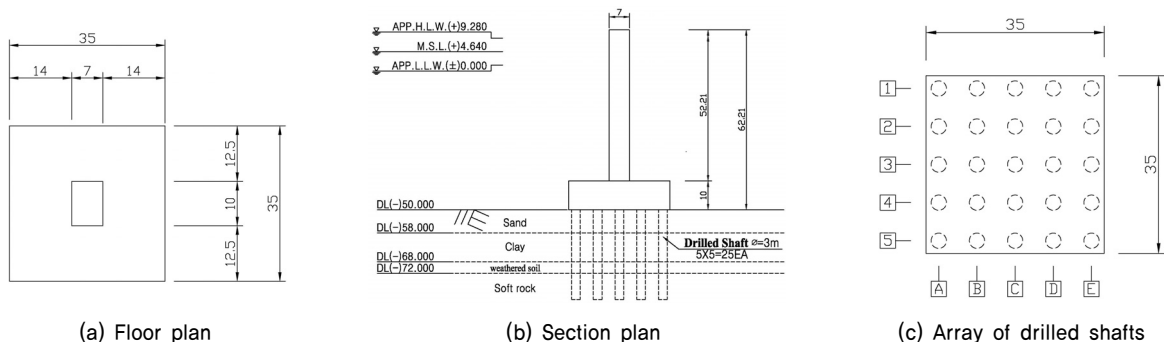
Outline of a deep water depth composite foundation supporting the high rise pylon of a super long span bridge (unit : m)
